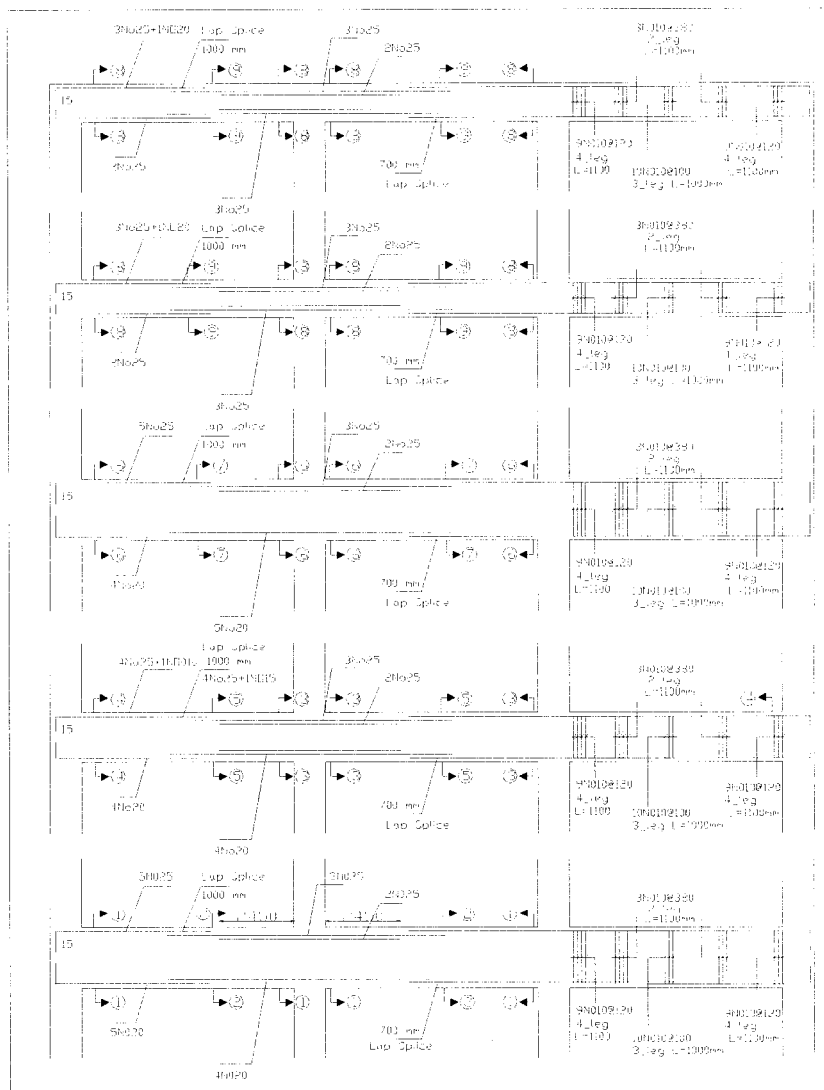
Elevation of beam, longitudinal reinforcement (ductile frame)
